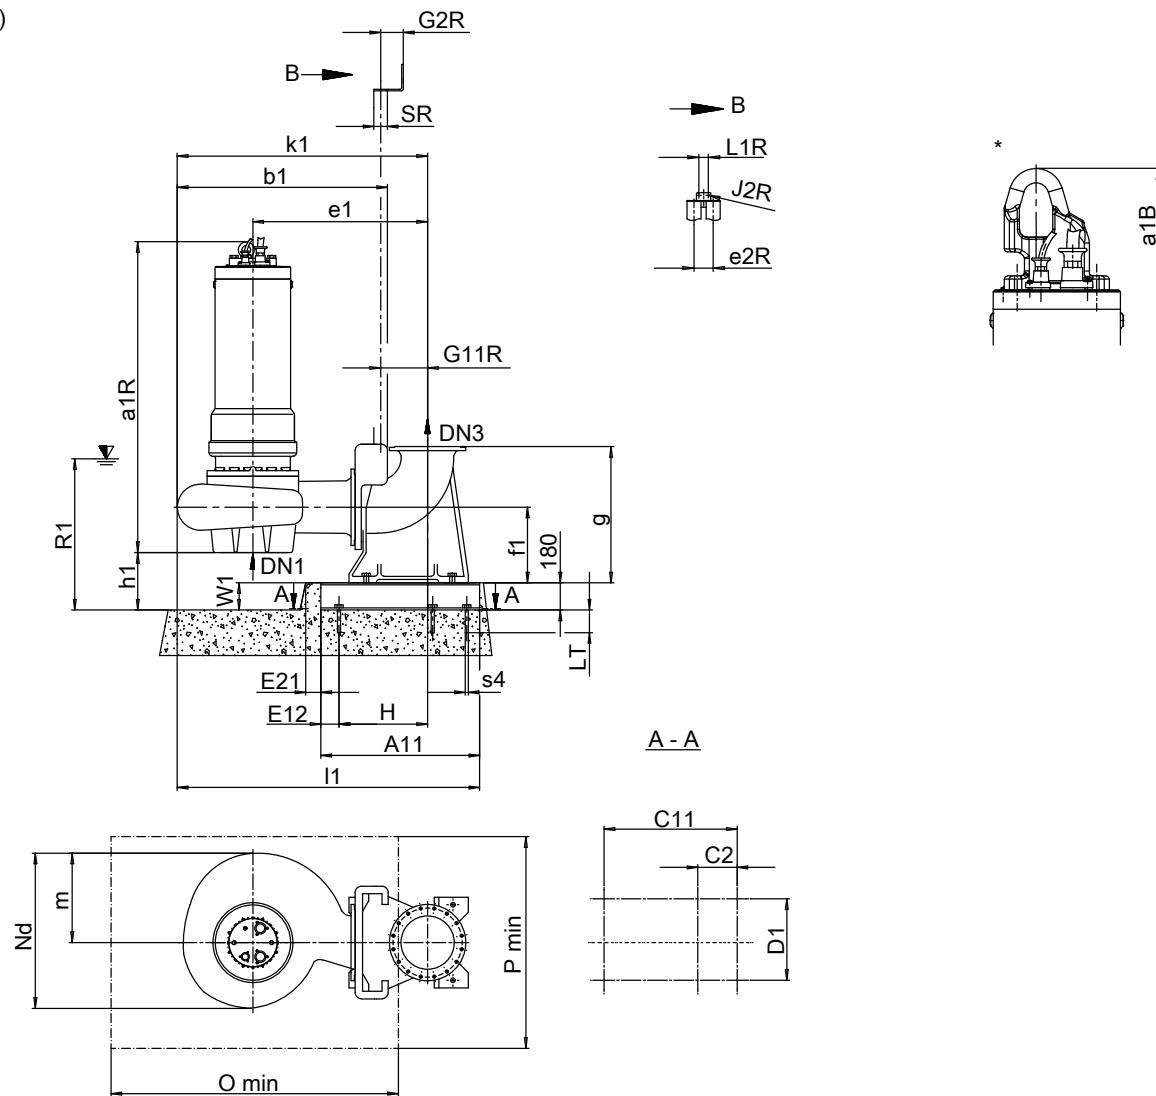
General arrangement drawing S2, stationary on duckfoot bend, guide rail arrangement, foundation with step, with foundation rail, small upper holder, motor version N
